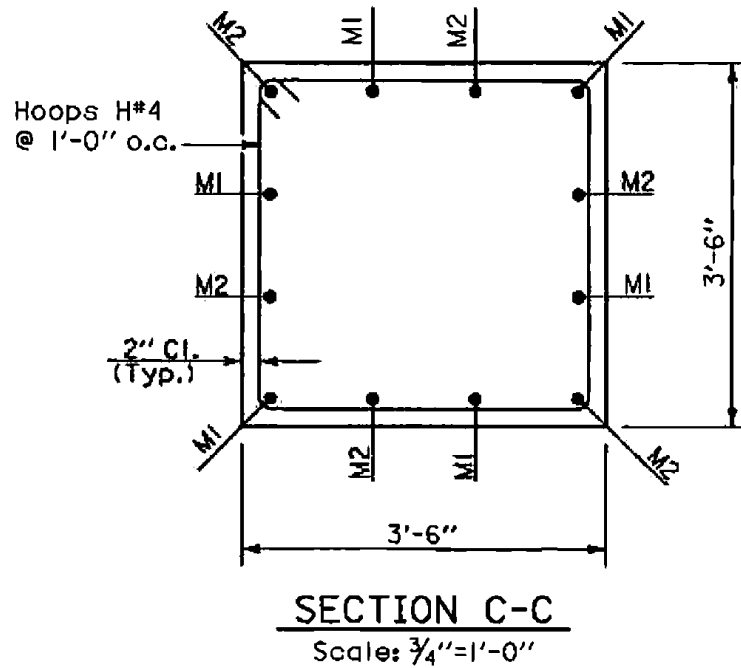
Etowah County Bent 2 column cross section (ALDOT 2011)
